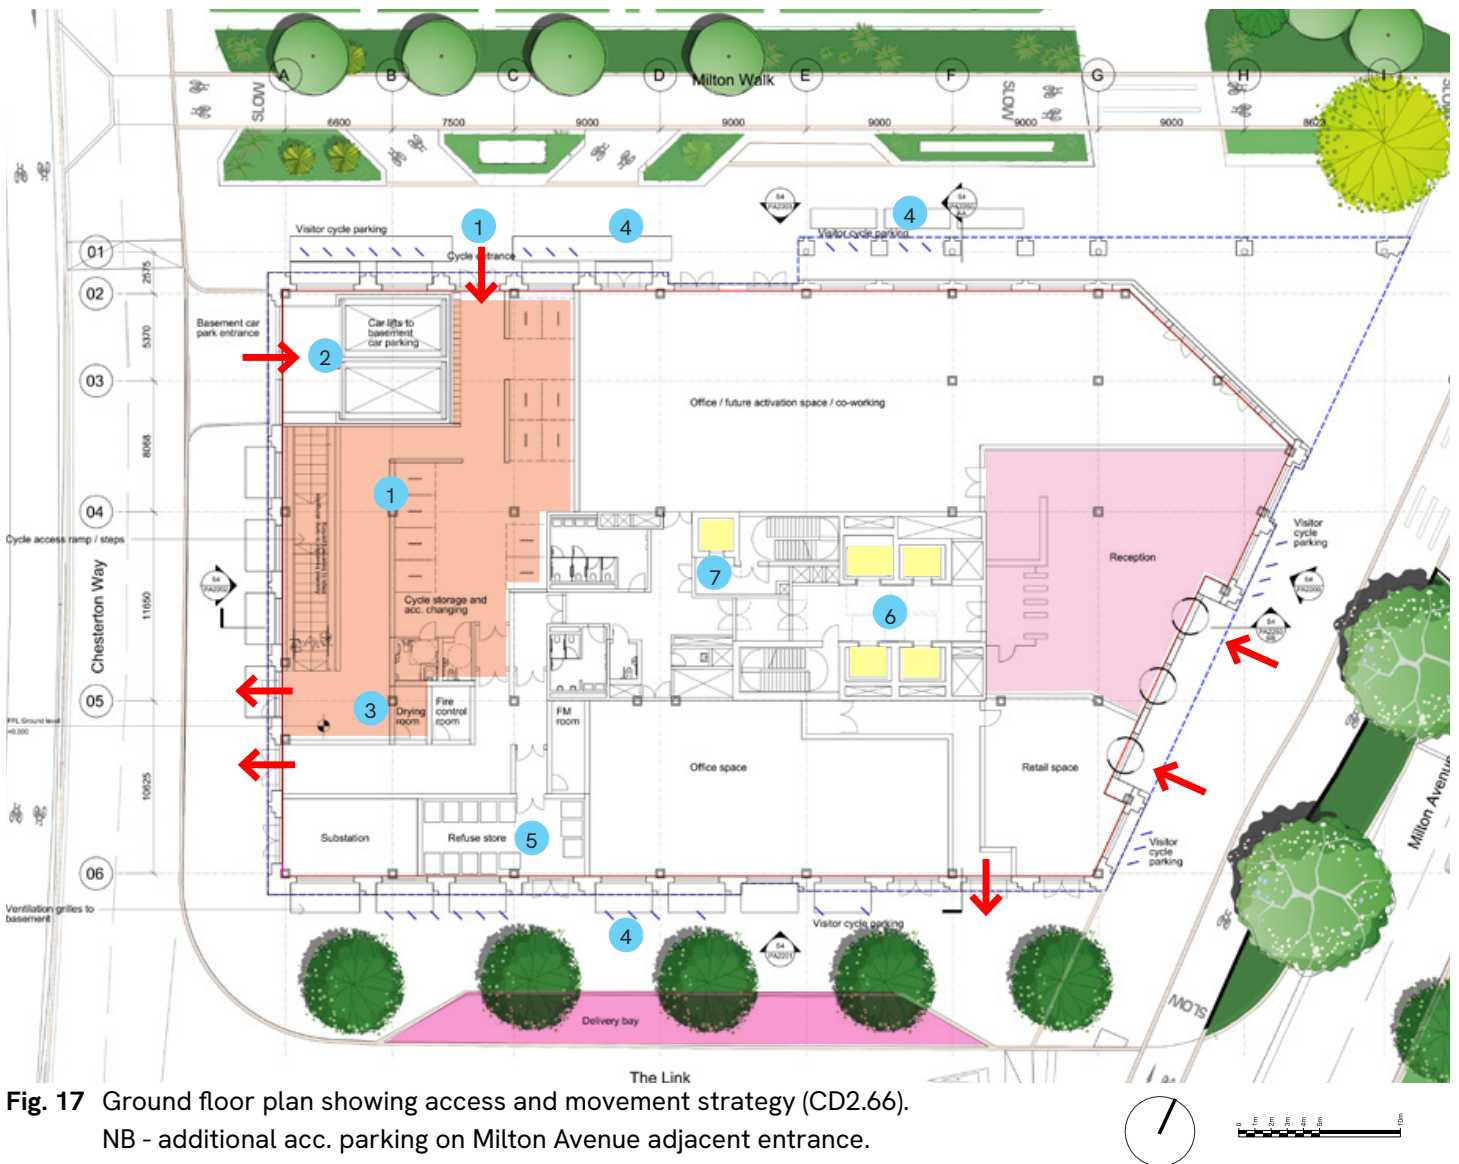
Ground floor plan showing access and movement strategy (CD2.66).
